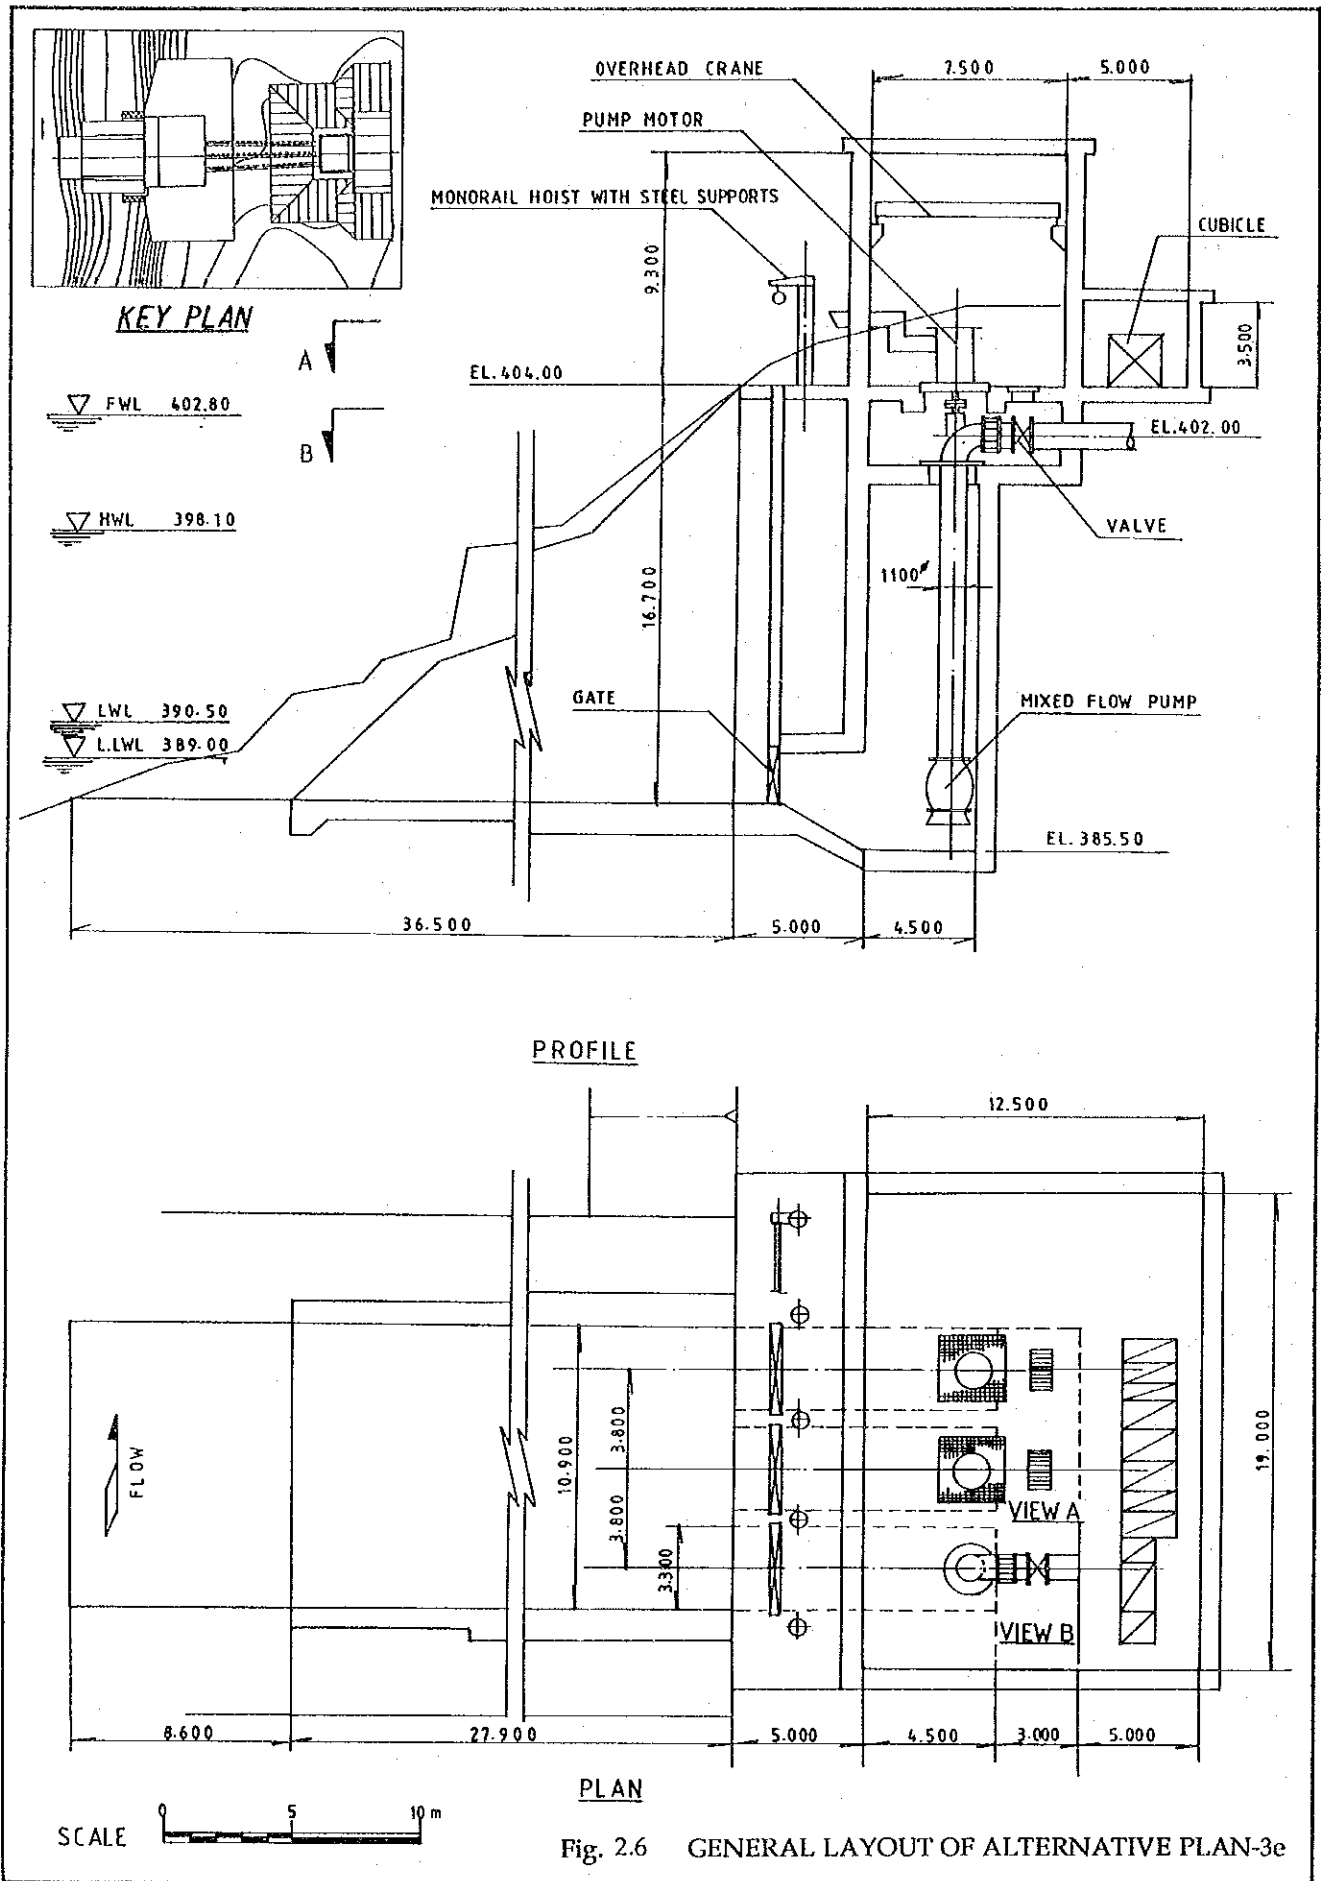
GENERAL LAYOUT OF ALTERNATIVE PLAN-3e
